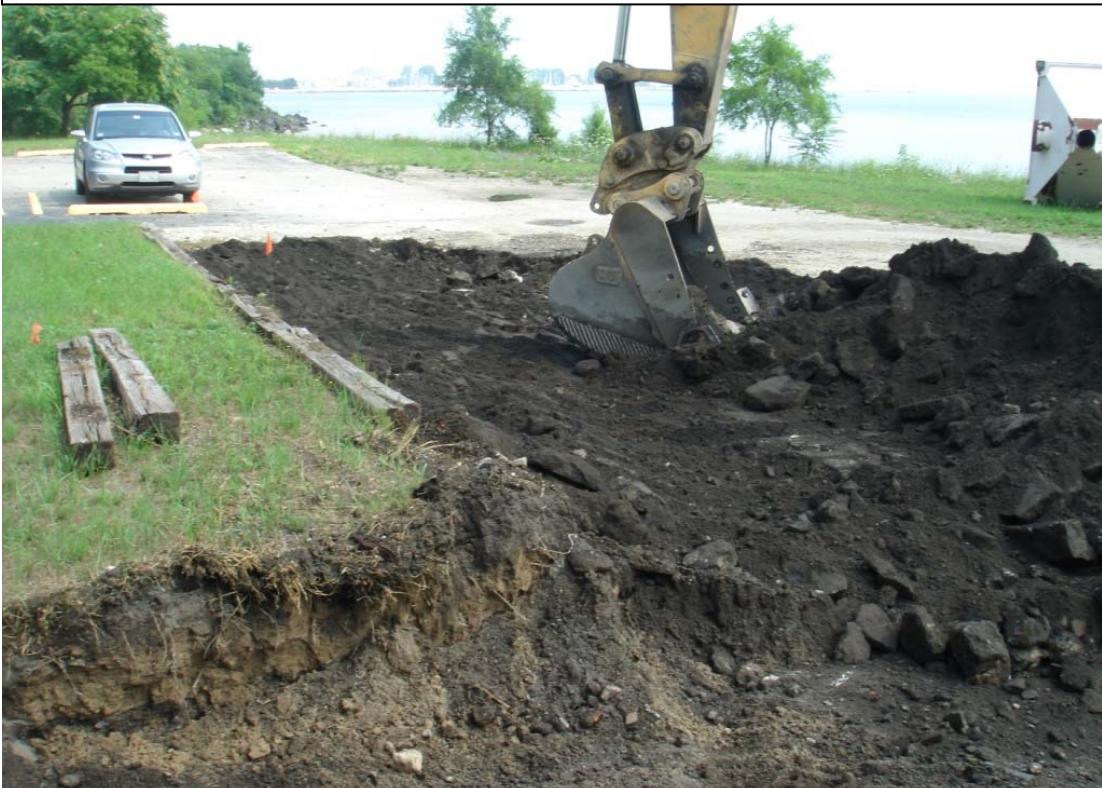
August 5, 2008 Final Surface Soil Removal, Off-site Disposal at Lake Shore Foundry
